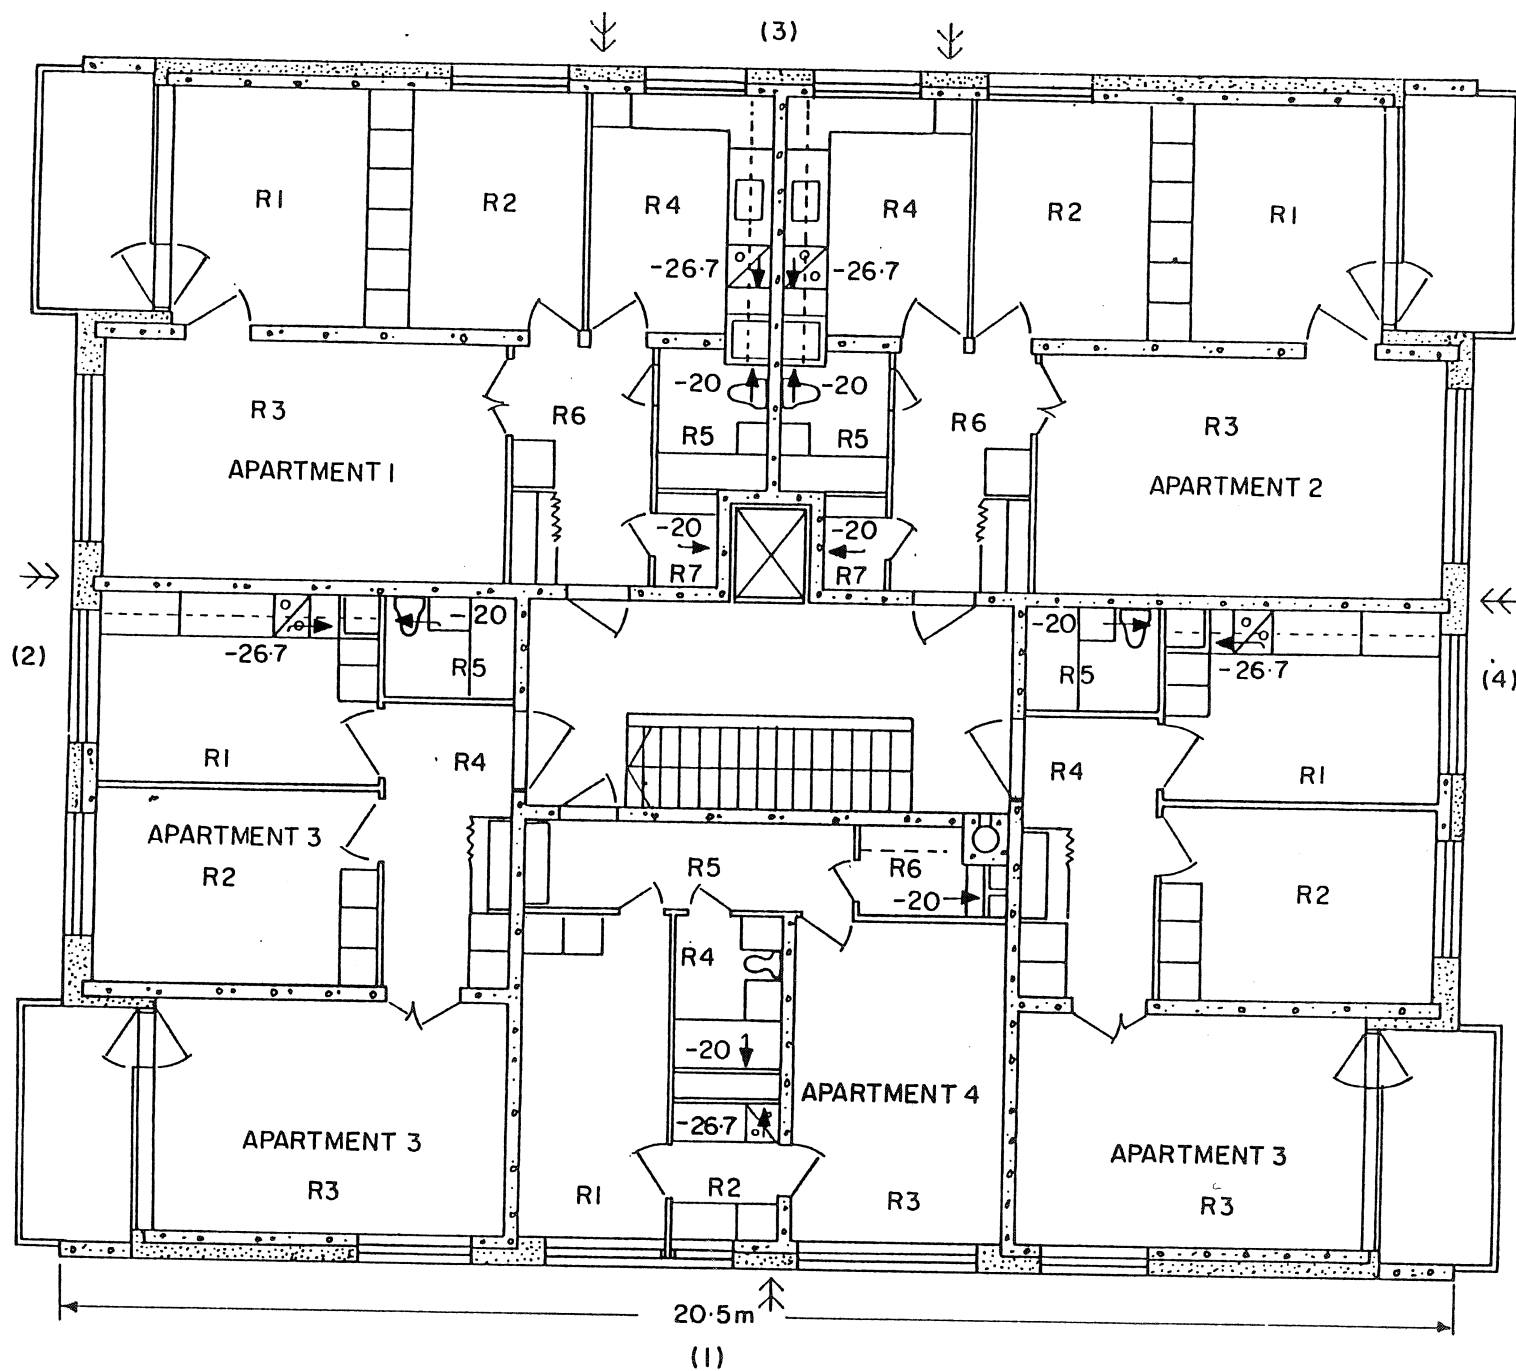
Floor plan of the example house with apartment, room and wall numbers and design exhaust air flows in 10—3 kg/s.
